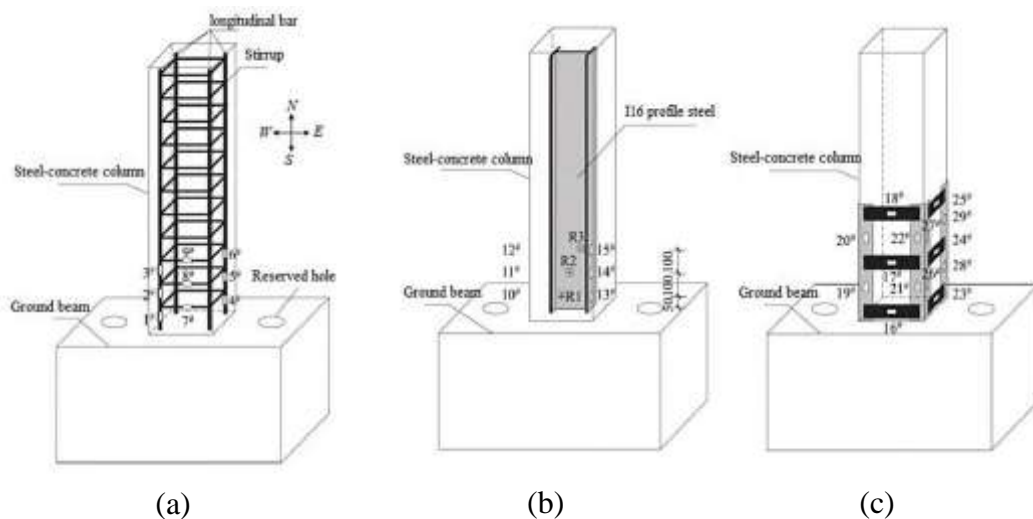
Column specimens: (a) longitudinal reinforcement and stirrups, (b) profile steel, (c) steel envelopes [5]
